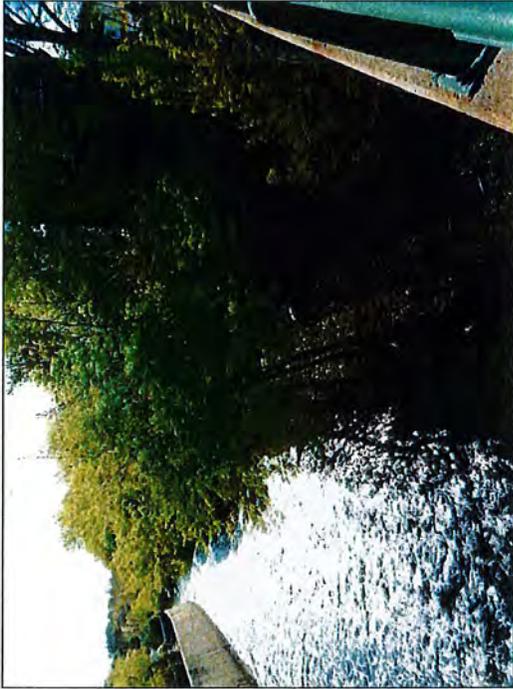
Water Street: Heavy vegetation and shoaling on the downstream right bank.
